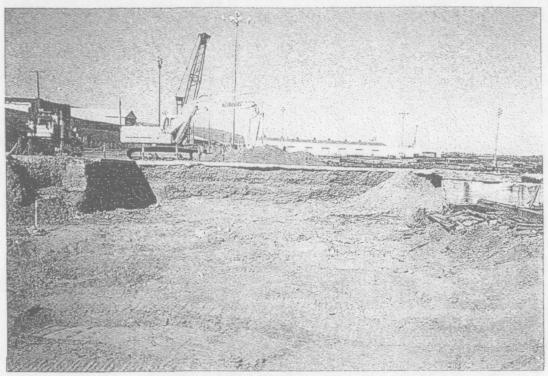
Areas 2 and 3 excavation, shoring along Front Avenue in the background (looking west).
